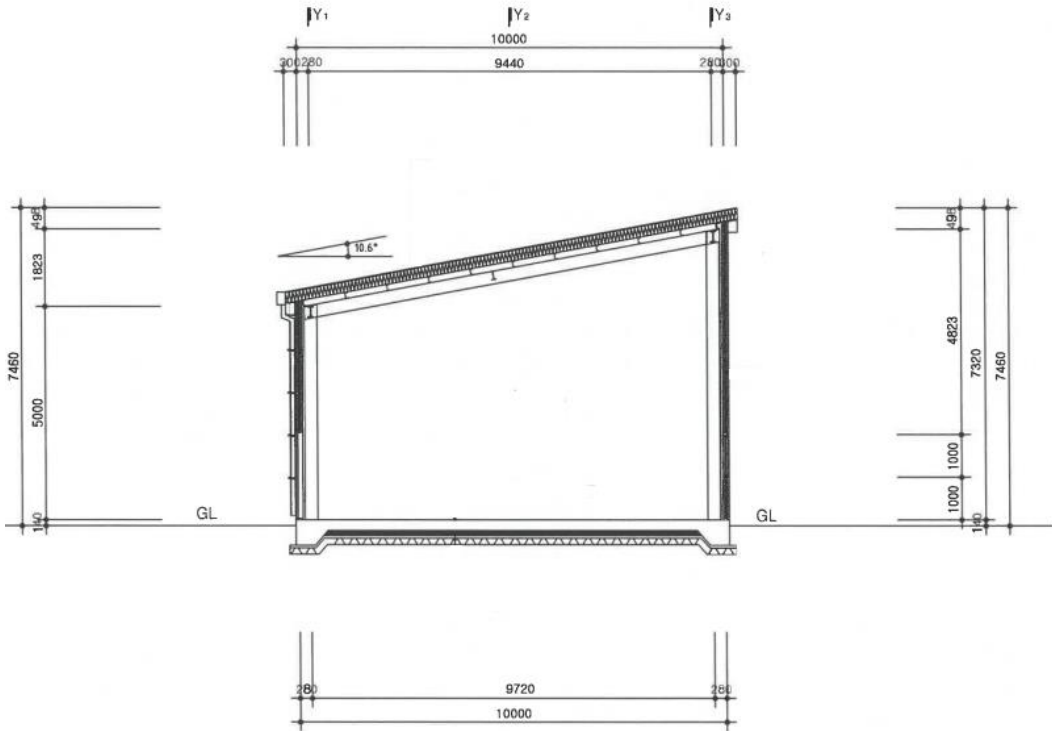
Roof type & Pseudo-BIPV structure (Side view)
